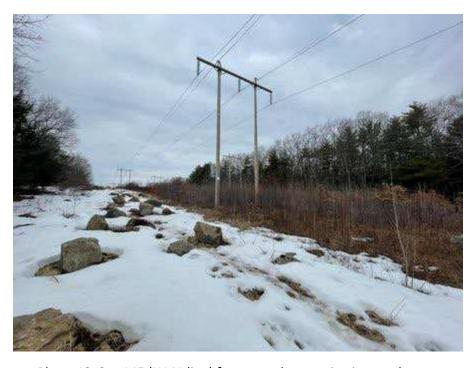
Str. 145 (H141 line) future work area, viewing northwest.
